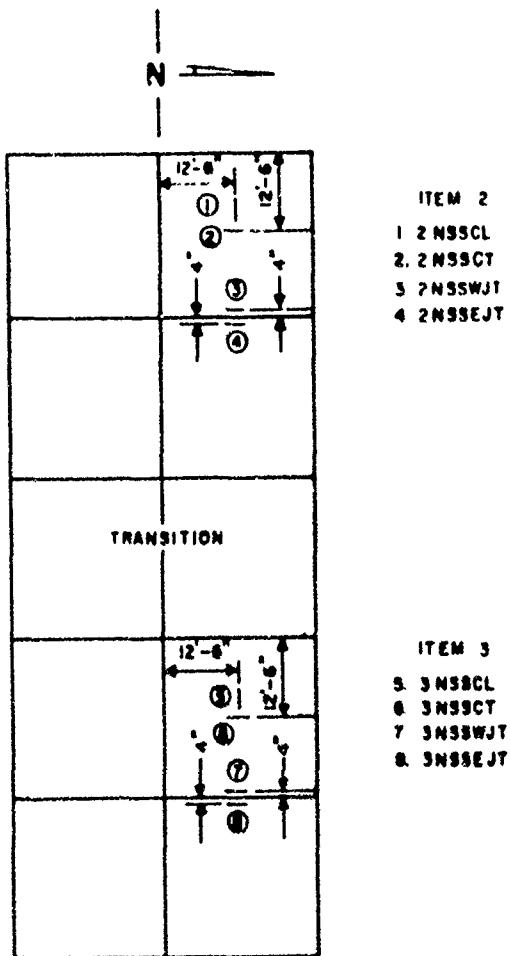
Instrumentation layouts for the twin tandem assembly, rigid pavement test section.
